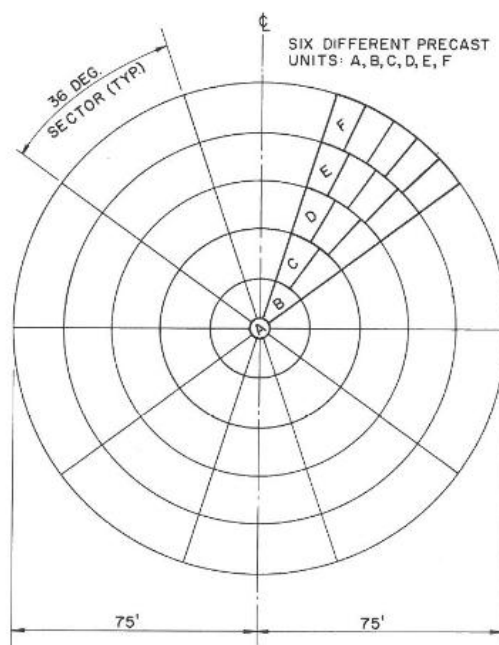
Arrangement of precast panels for dome at Natick, USA
